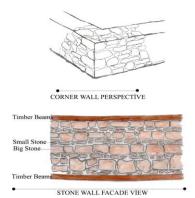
Perspective and elevation view of stone masonry wall, inventory number 155.
